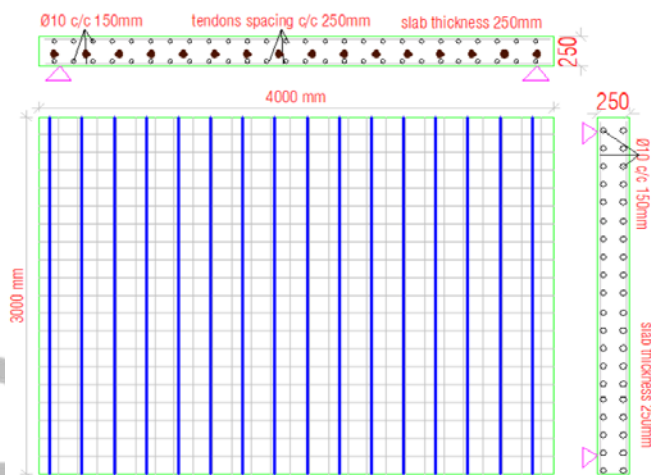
Detailing of onsite specimen P1-2 by (Rafal Szydowski and Barbara Labuzek, 2017)
